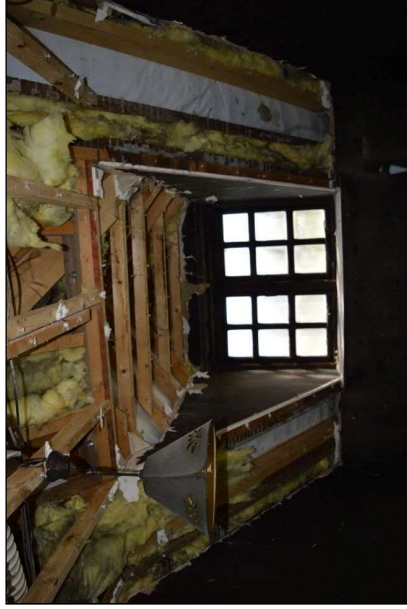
Modern dormer window in bedroom 2 (CPAT 4900-0053)
